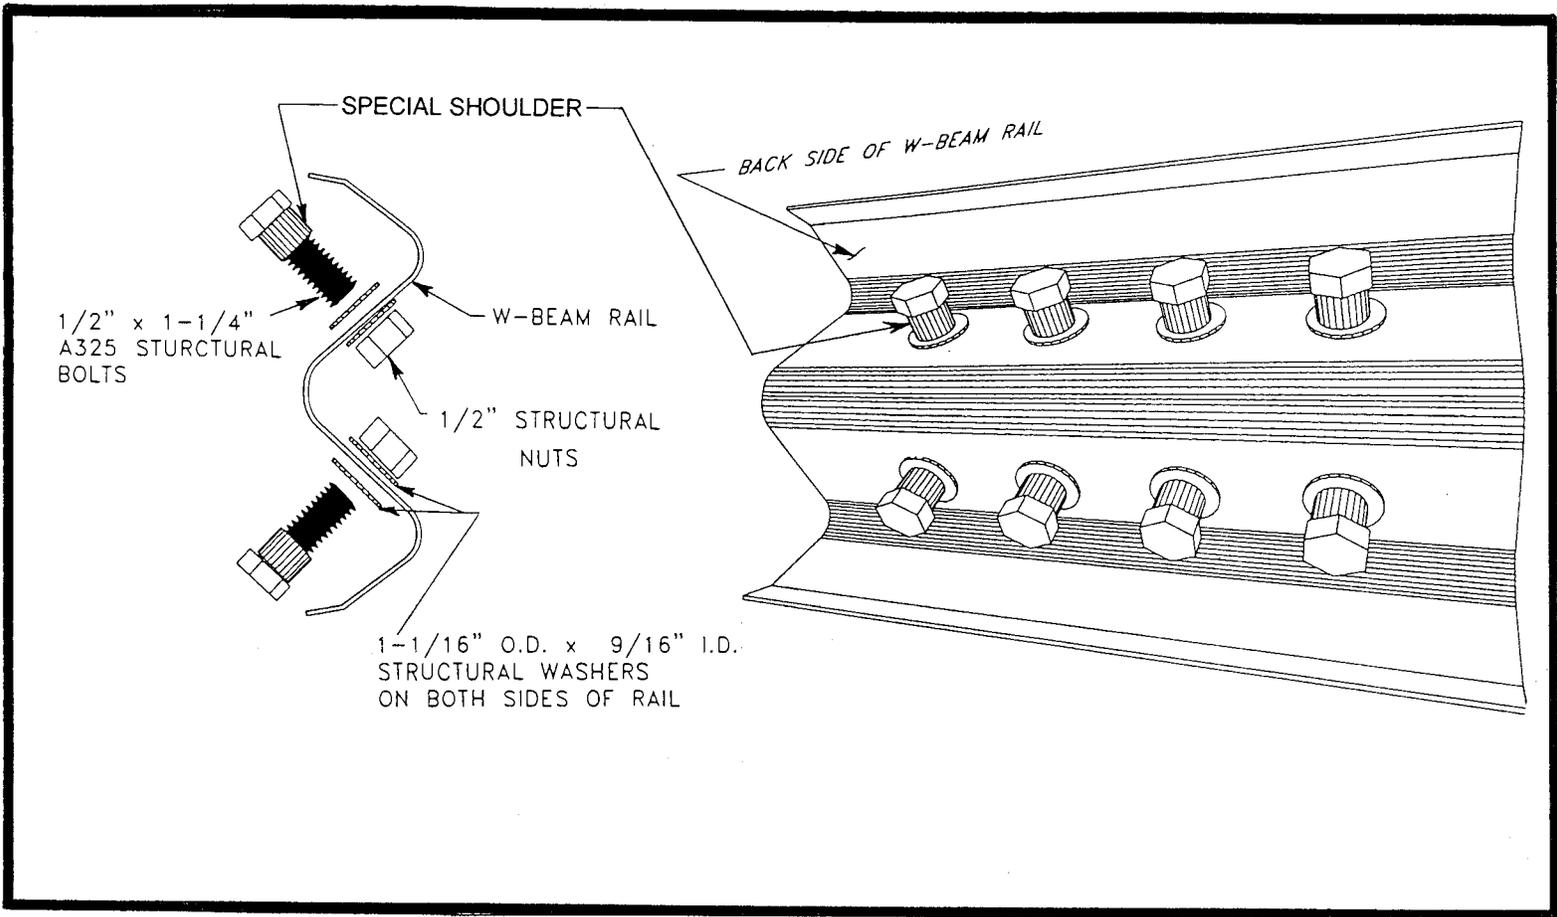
Installation of Cable Anchor Bracket Shoulder Bolts.
